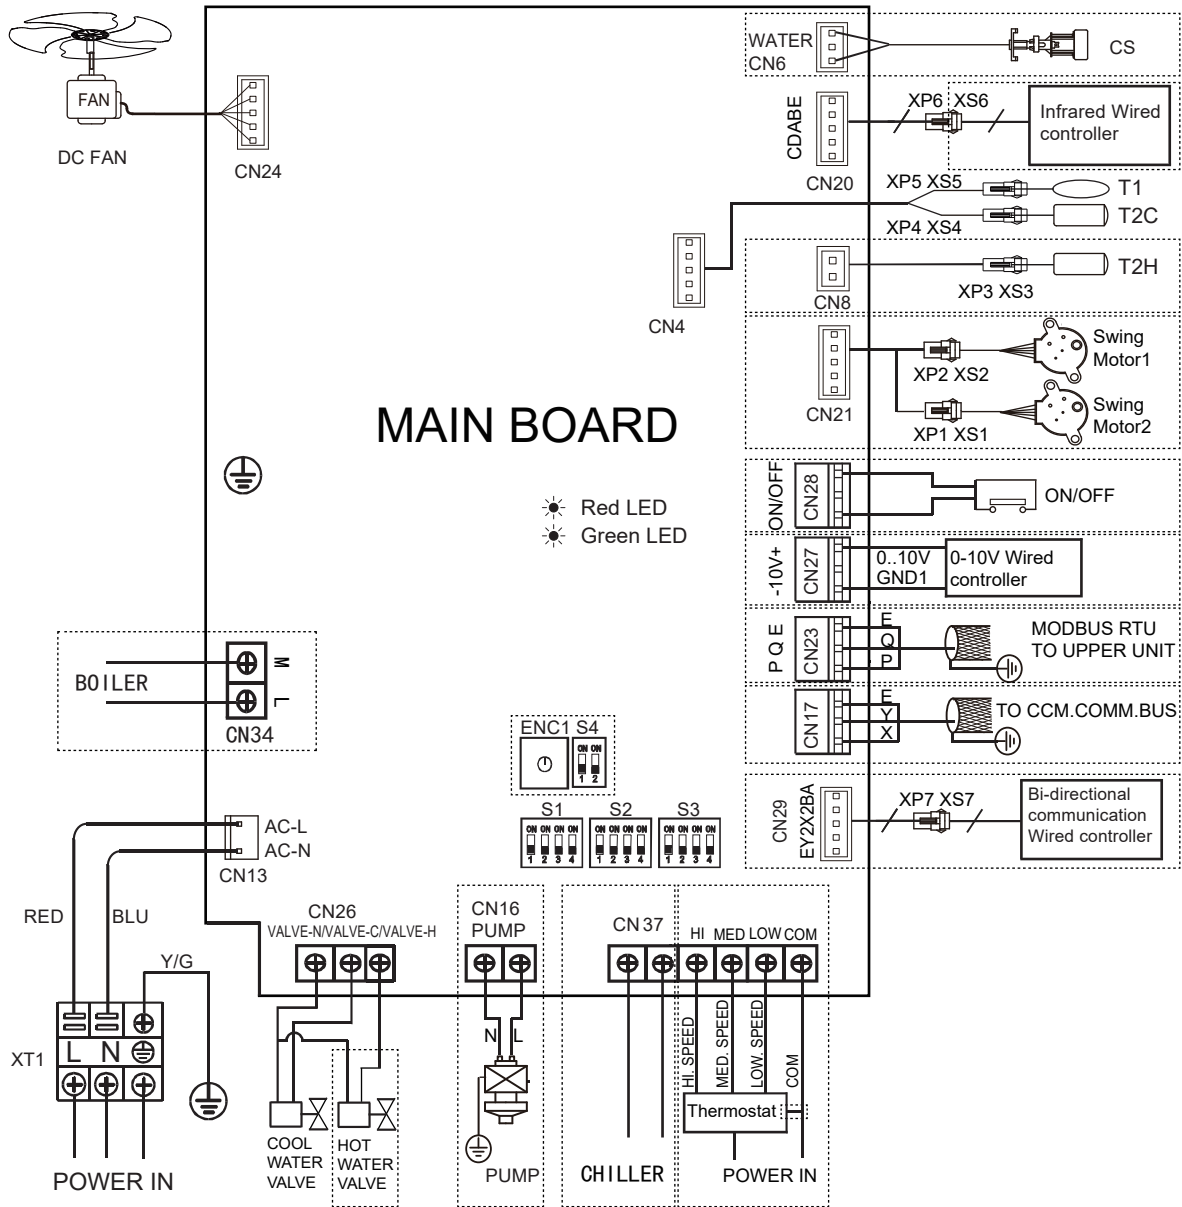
Wiring diagram (unit with inverter motor I-VM; I-VN)
